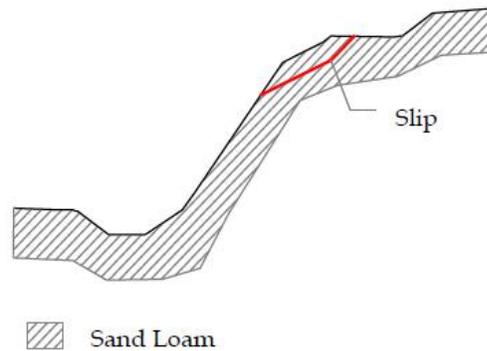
A typical stratification pattern that has collapsed on the slopes of Nagrak Street
